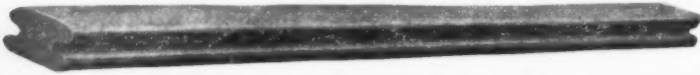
NEW REINFORCEMENT FOR CONCRETE.
